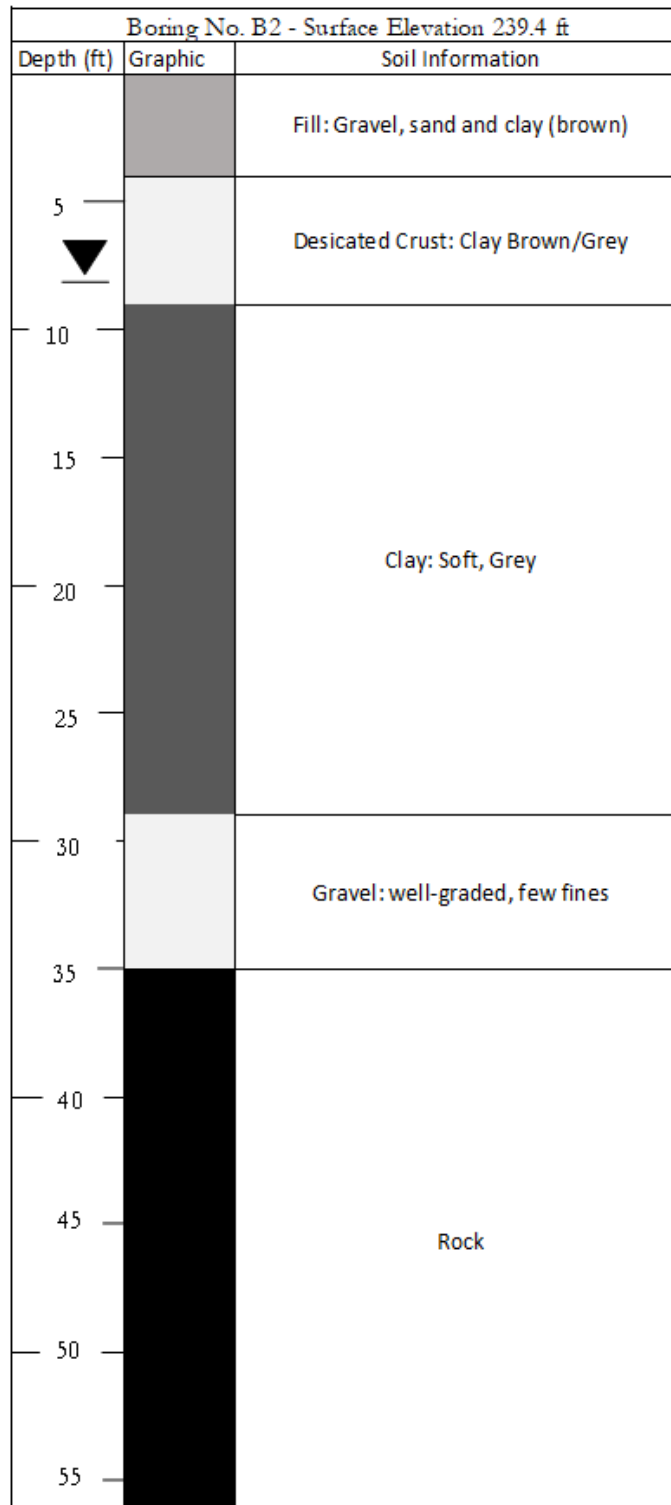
Boring B-2 (note surface elevation and groundwater table elevation(prior to pumping))
